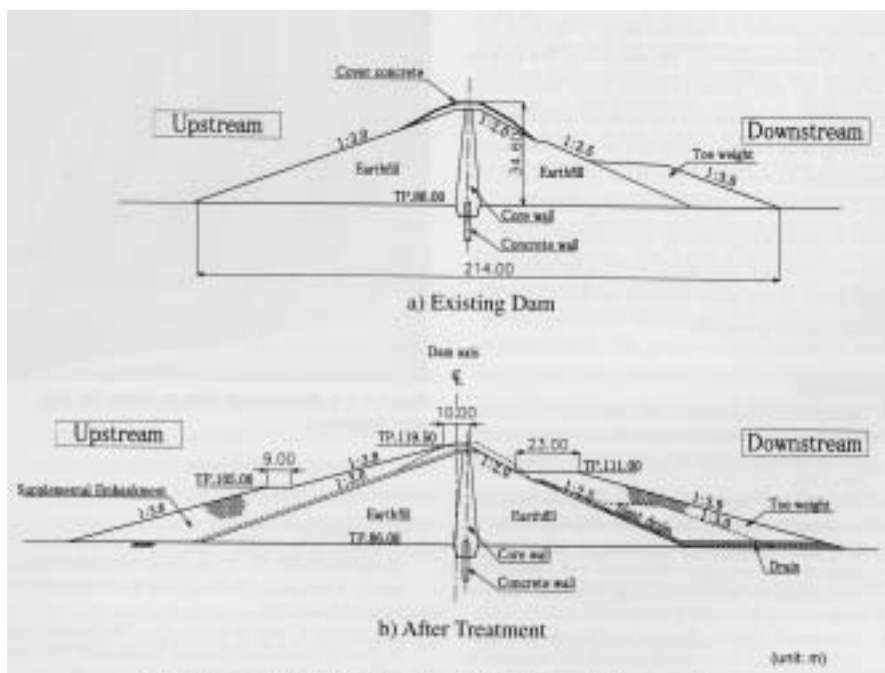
Typical Section of Existing and After Treatment(Yamaguchi Dam)
